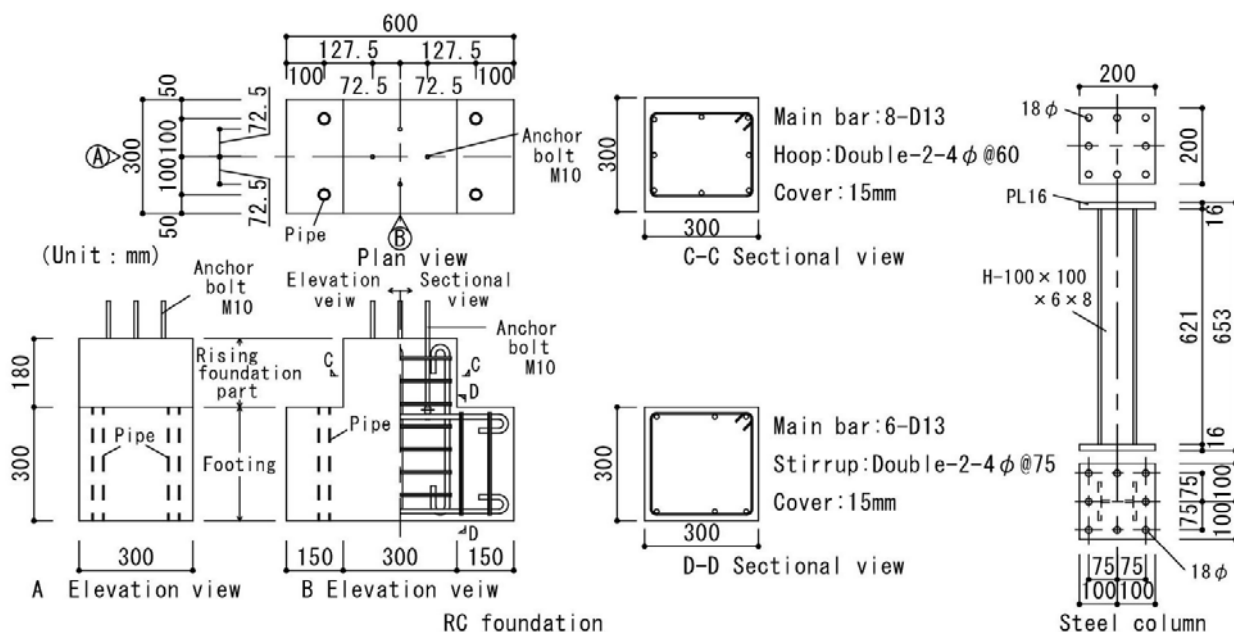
RC foundation Shape dimensions and reinforcement arrangement ,Steel column Shape
